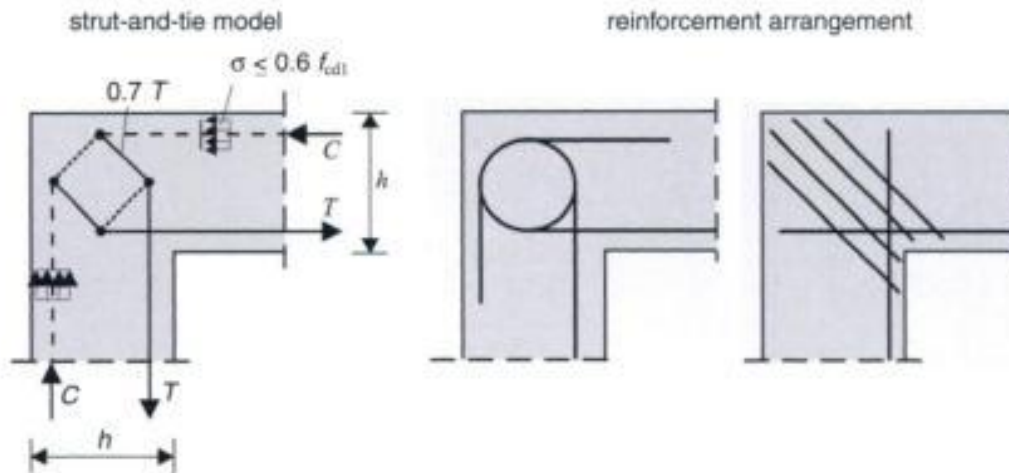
Frame corner with high opening bending moment; strut-and-tie model and resulting arrangement of reinforcement (acc. [13])
